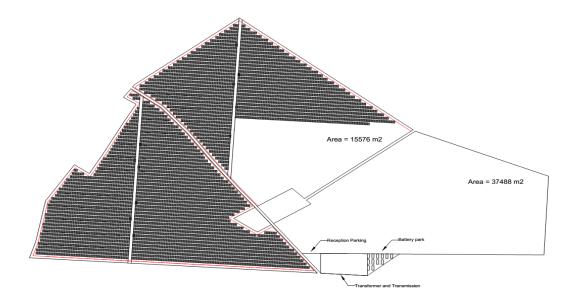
Indicative layout of proposed PV panels, battery storage plant and future expansion
